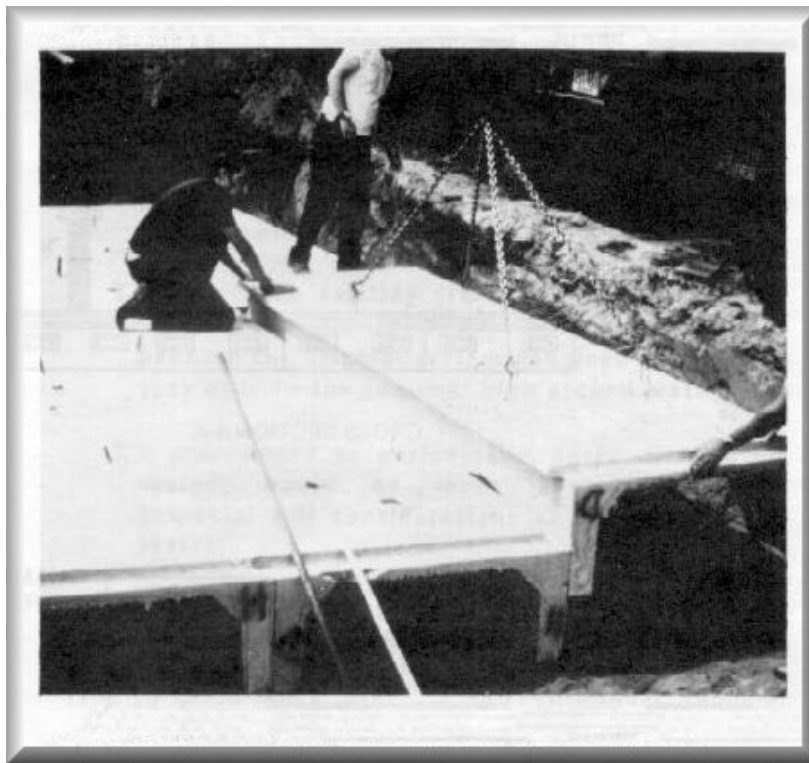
Concrete chamber system during construction (photo by A. Frick)
